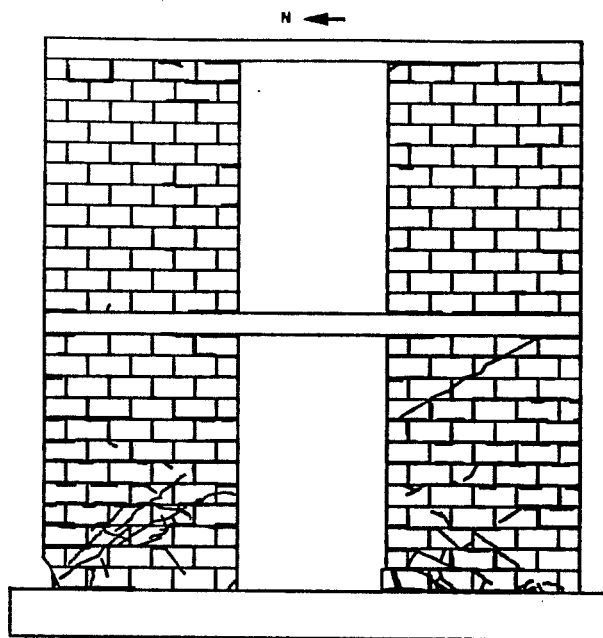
Sp. 2b: Progression of Wall Cracking at End of Test
